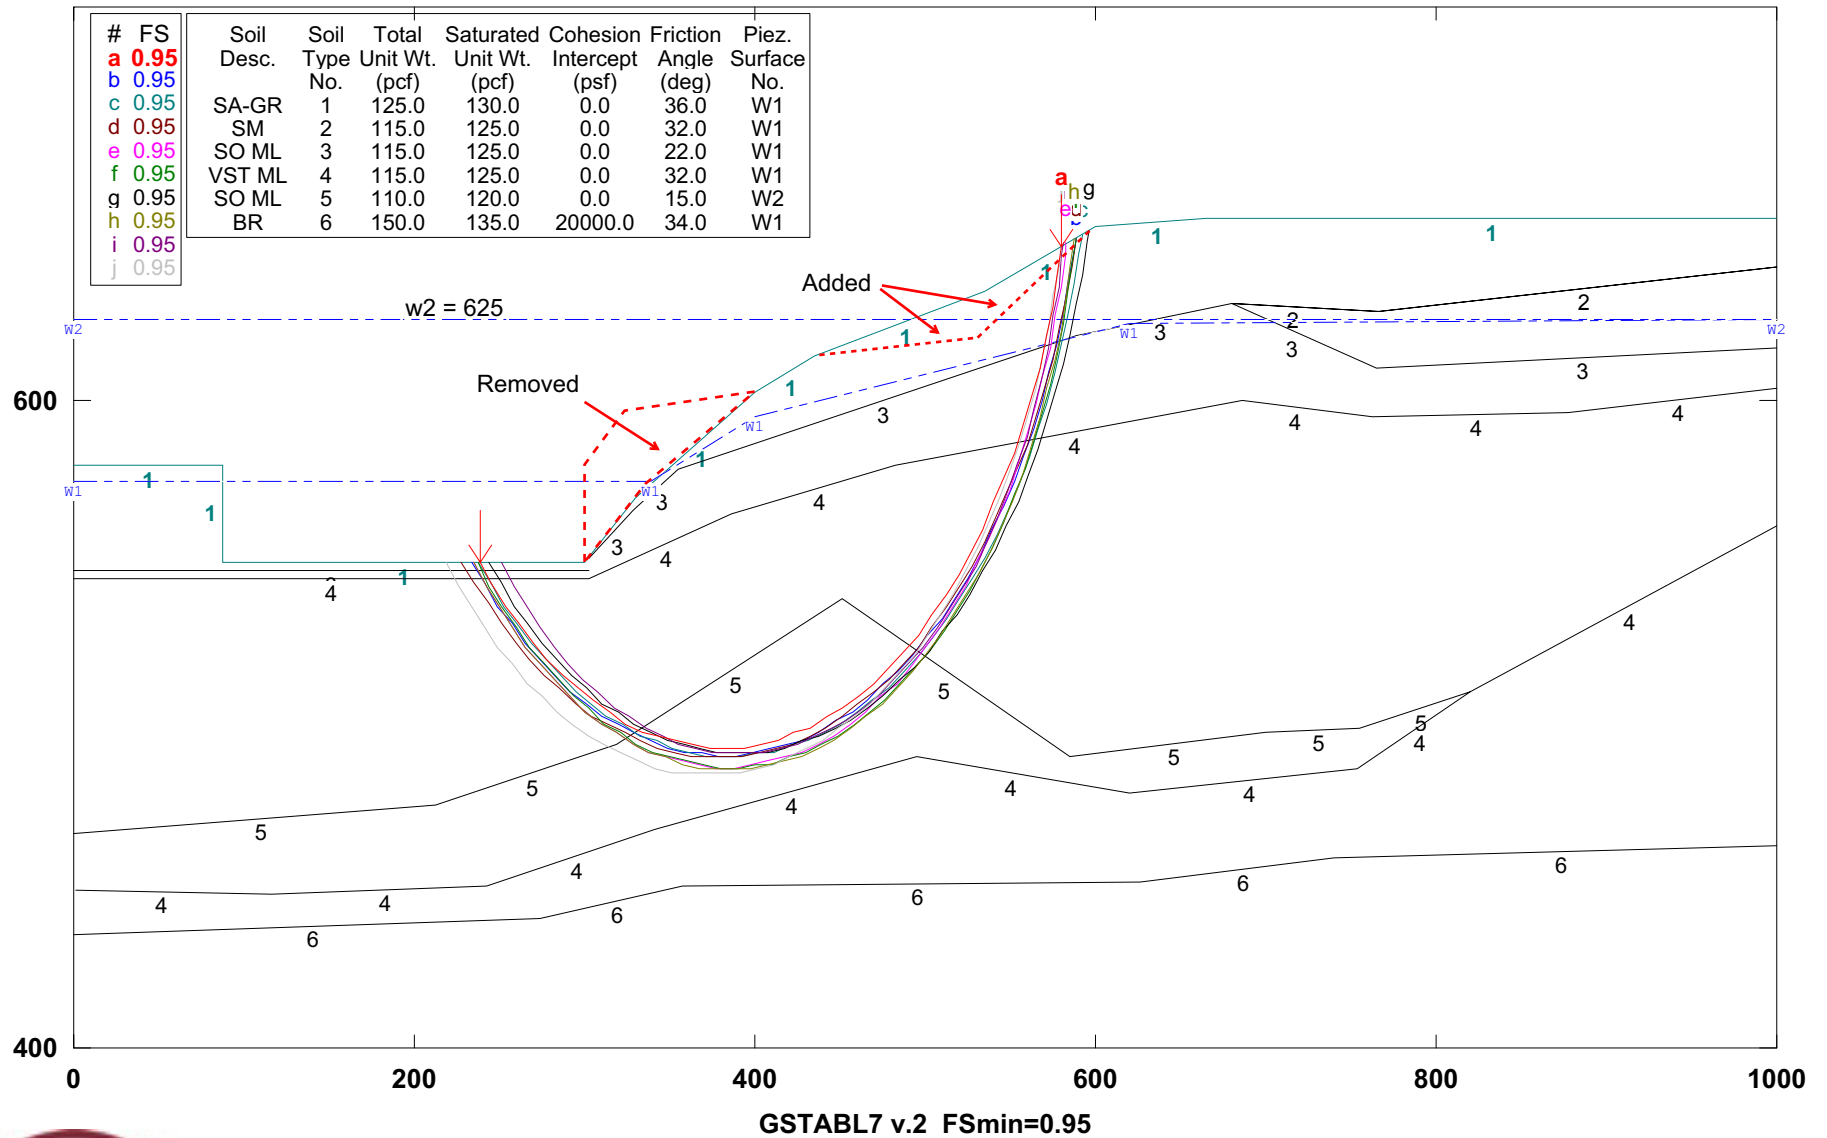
B.15: Effects of Recent Construction Involving Removing Sheet Piles and Flattening Slope on the Stability of Existing Section A-A.
